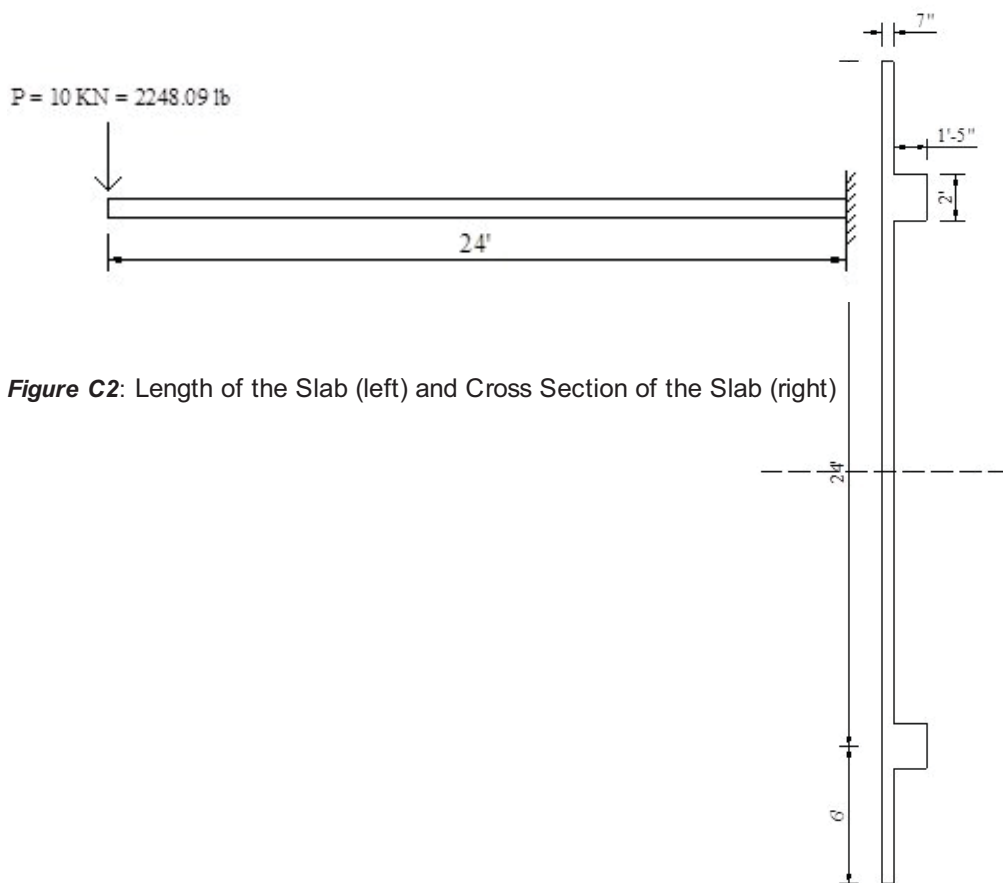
Length of the Slab (left) and Cross Section of the Slab (right)
